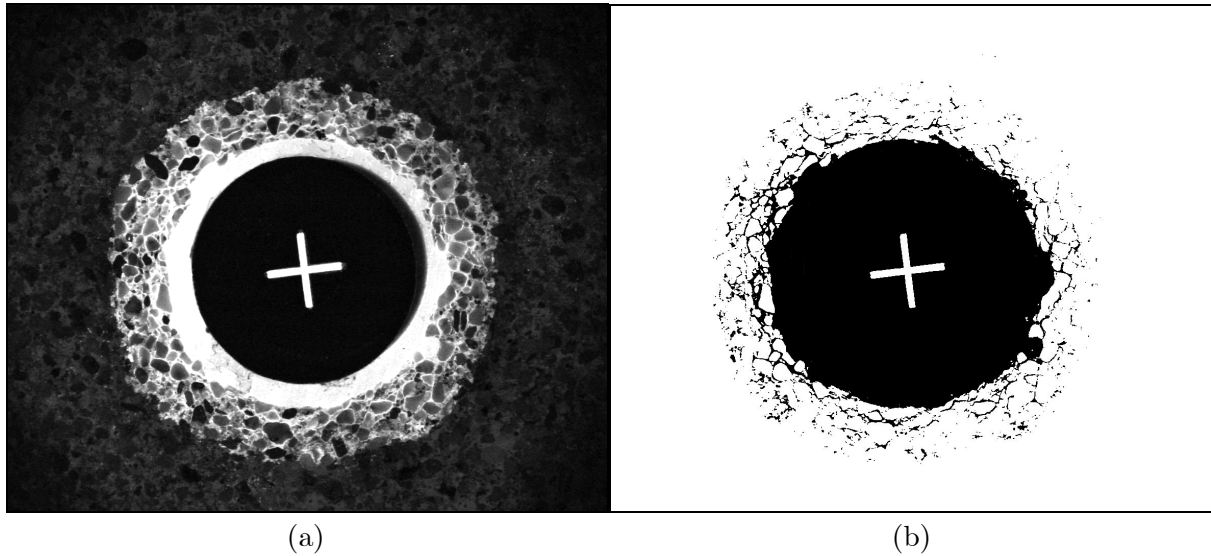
Failure pattern for specimen type B from M2. (a) Damage zone and fracture pattern highlighted under ultraviolet light and (b) the same after filtering the crack pattern.
